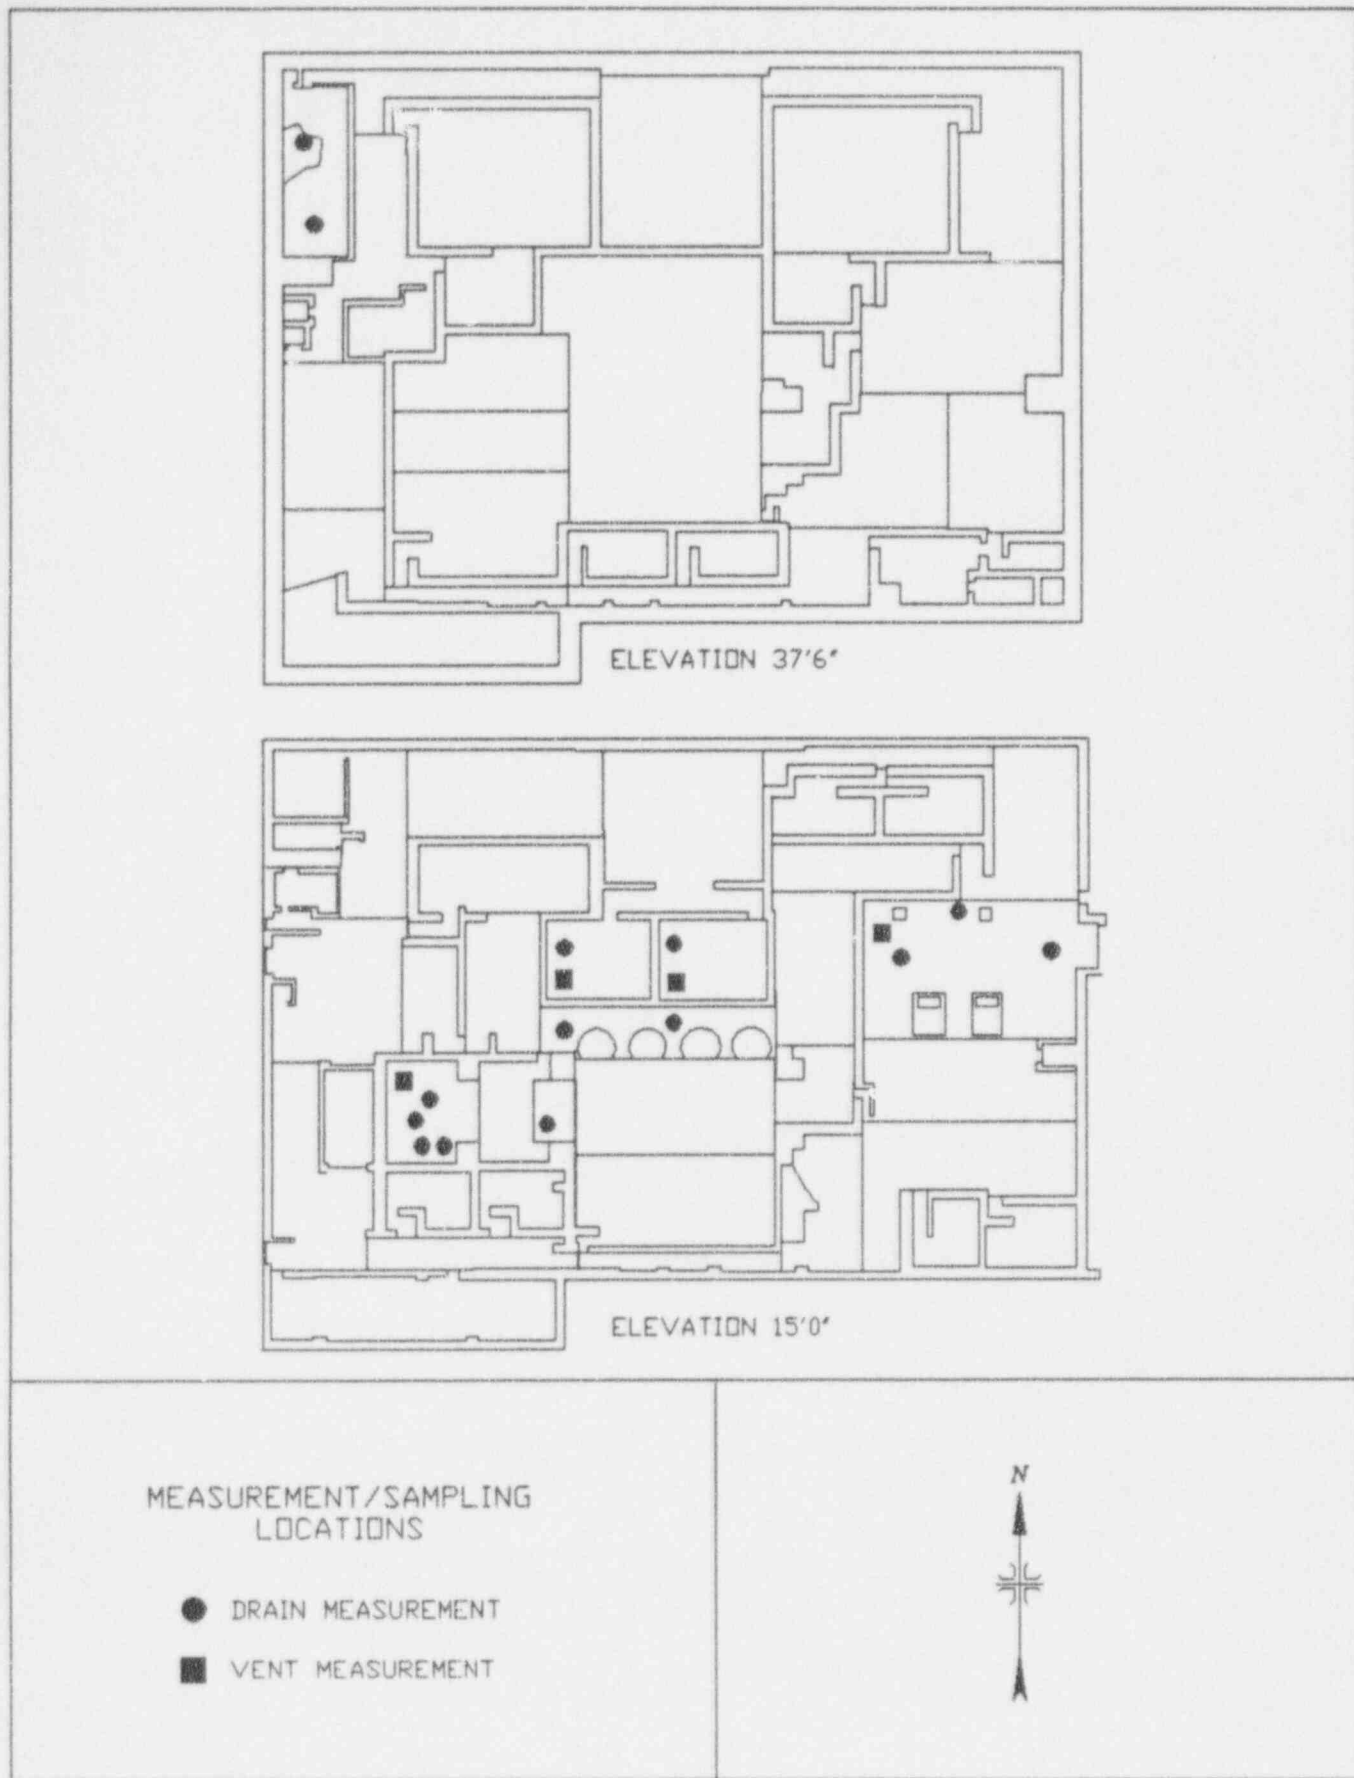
Turbine Building, 15' and 37'6" Elevations - Drains (SU014) and Vents - Measurement and Sampling Locations
